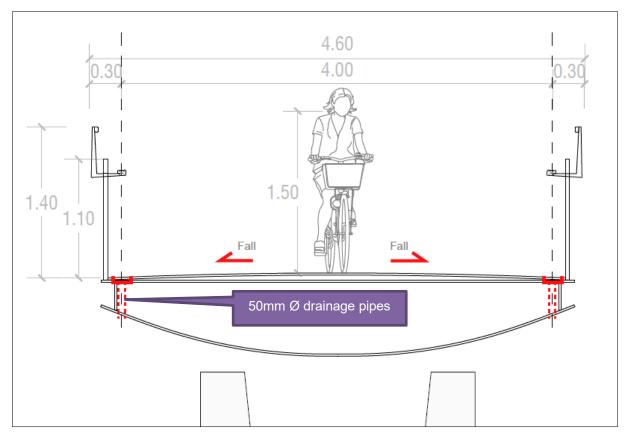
Indicative sketch of the proposed bridge drainage arrangement
